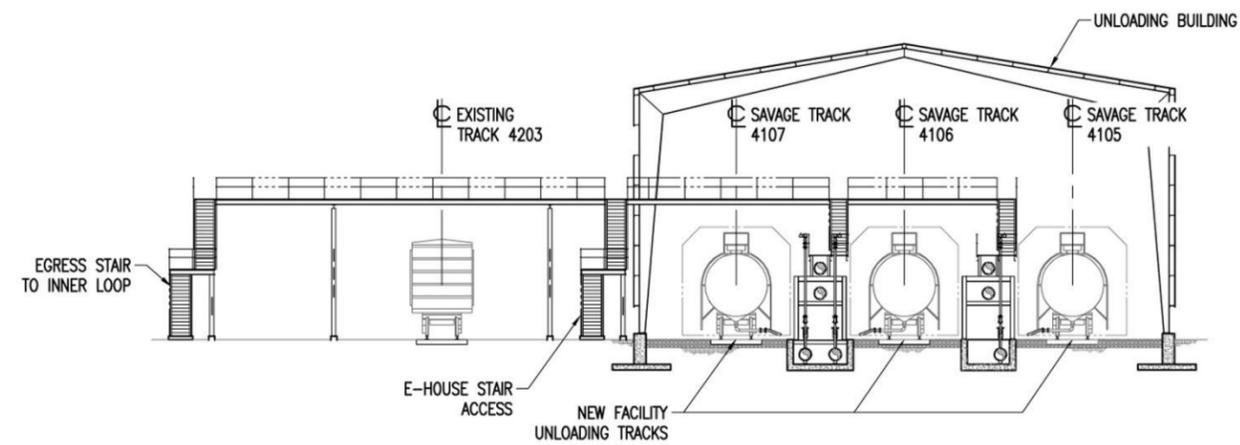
Rail Car Unloading Facility Cross Section
